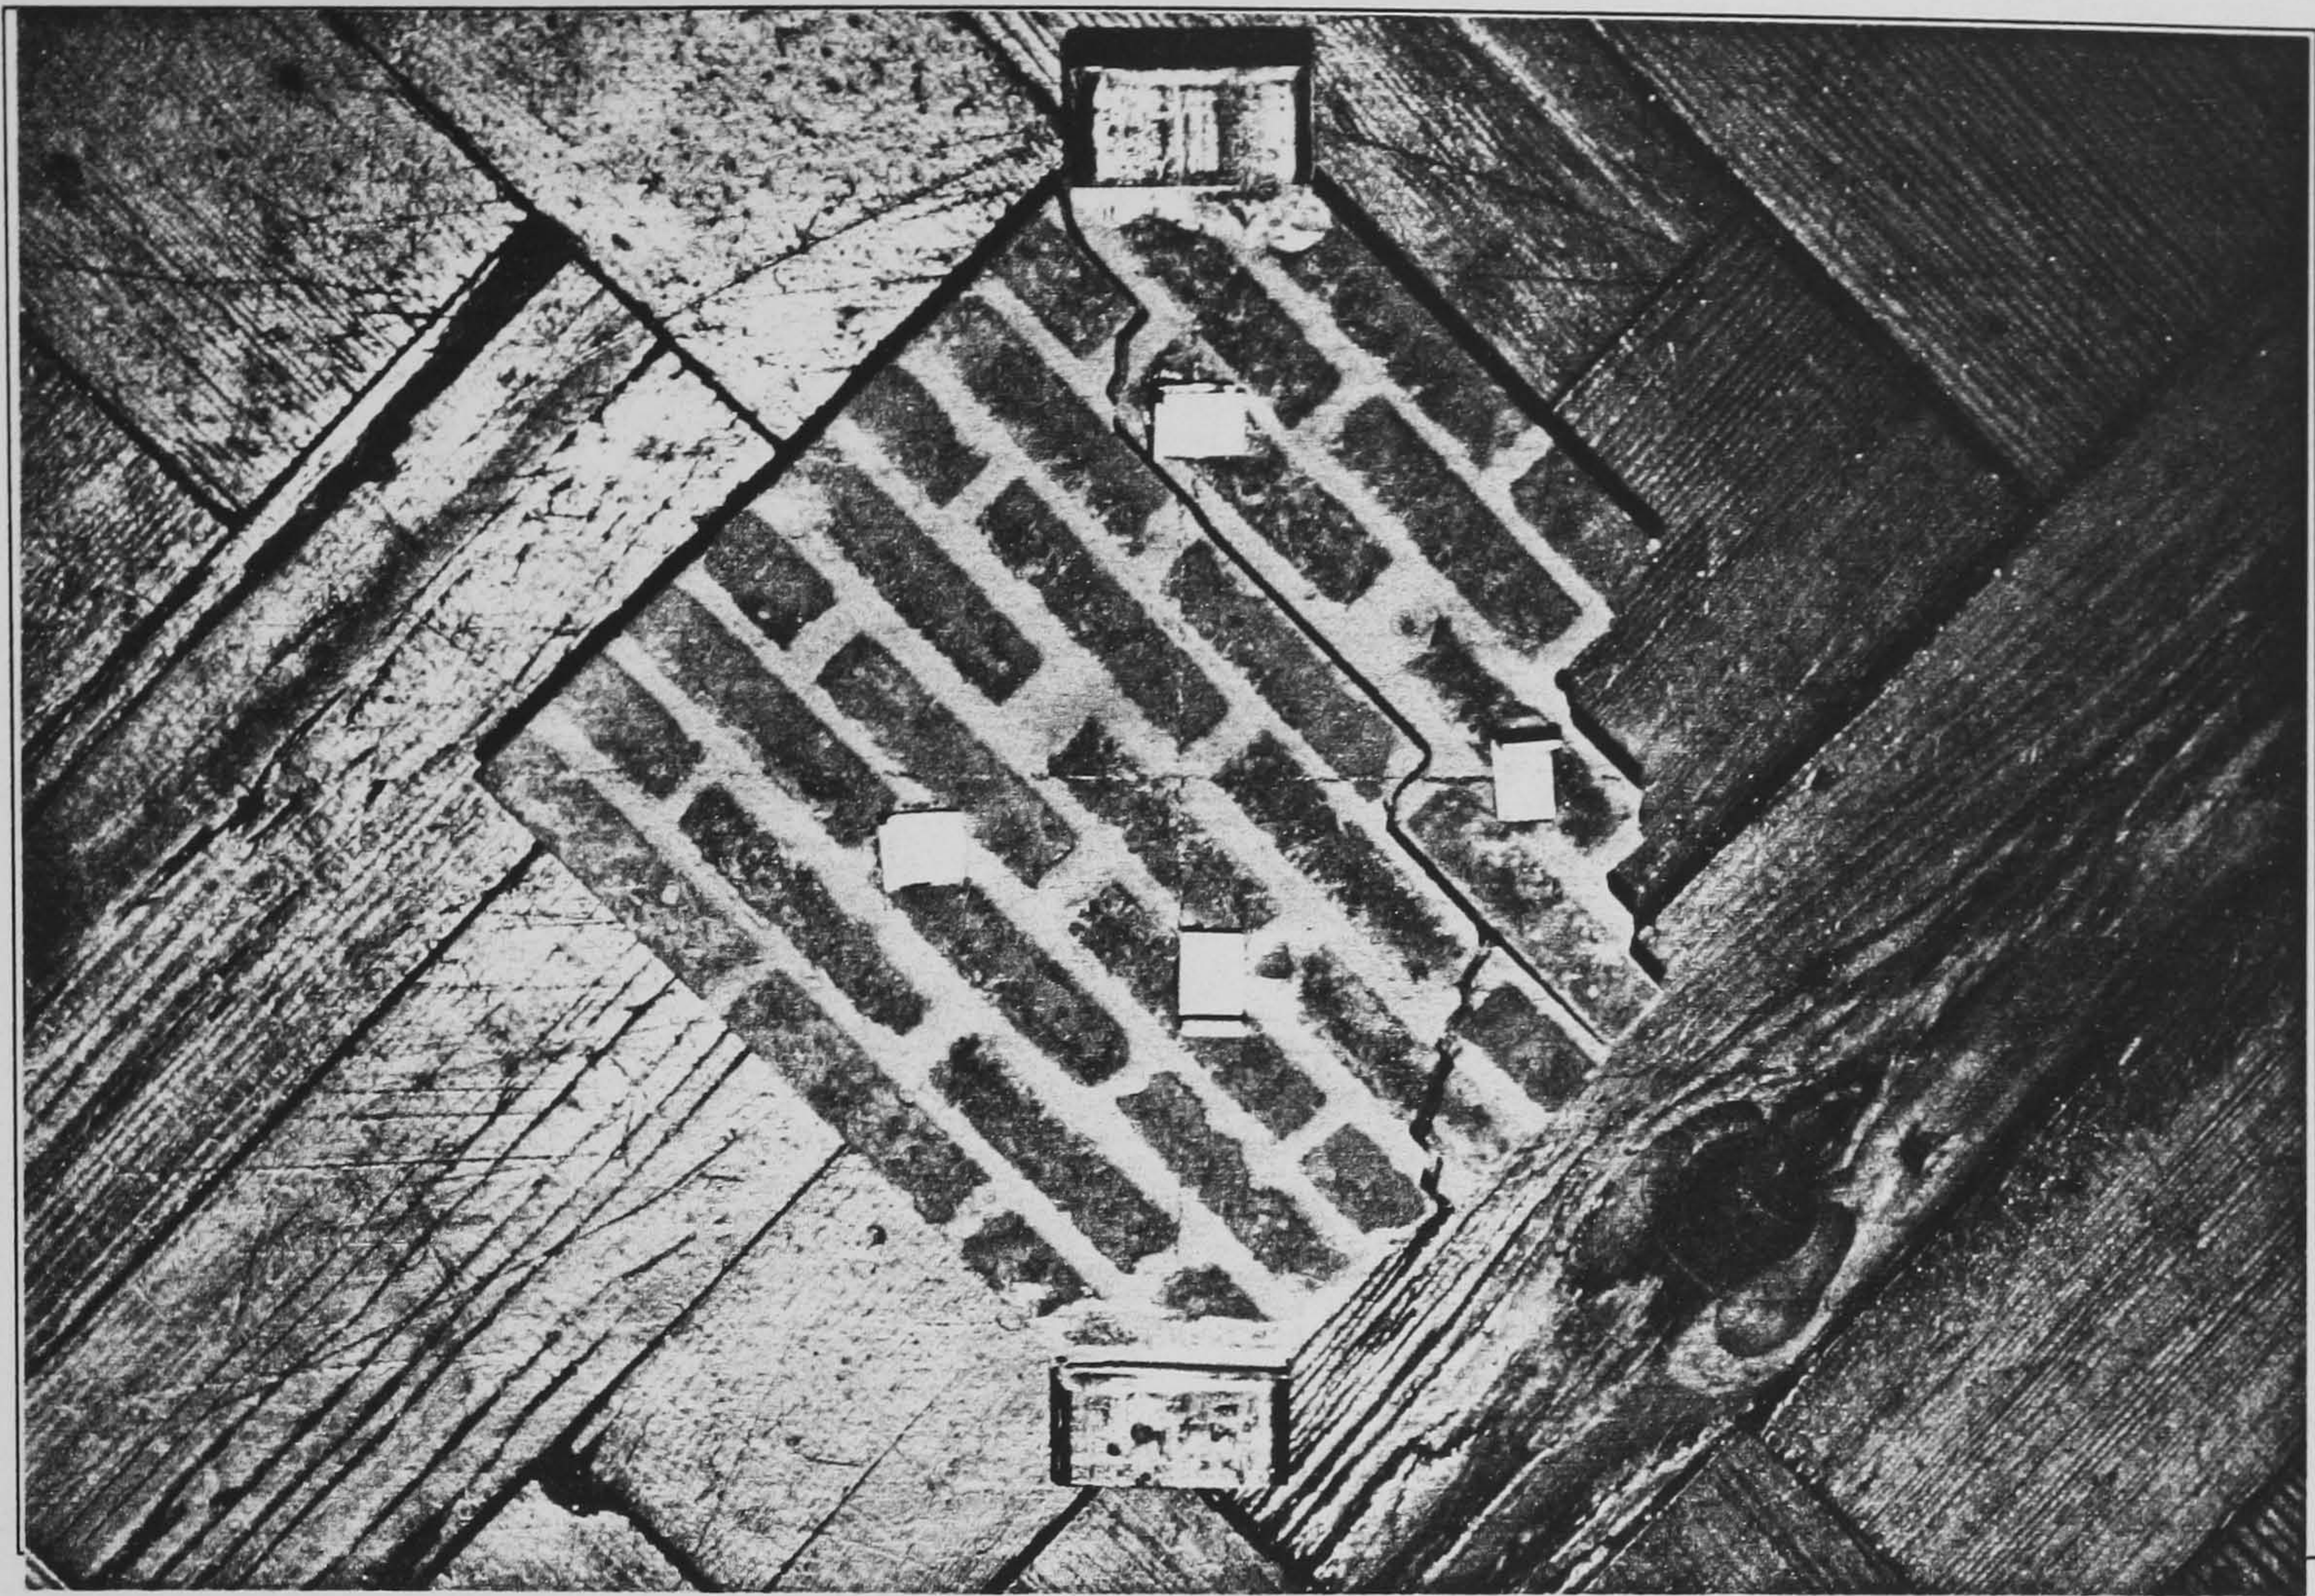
Shear-sliding mode of failure for 7-day large wallette
